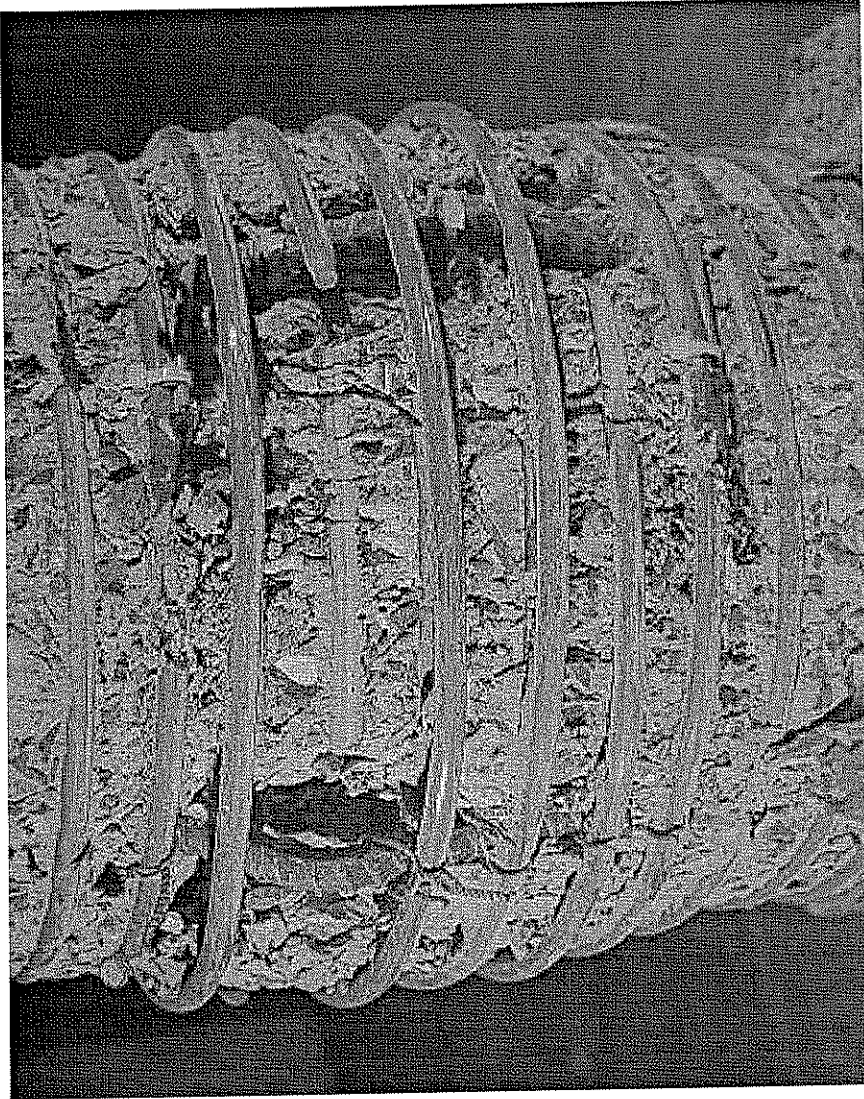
Schematic drawing of post-test appearance of Specimen 14-C<sup>1</sup>.
